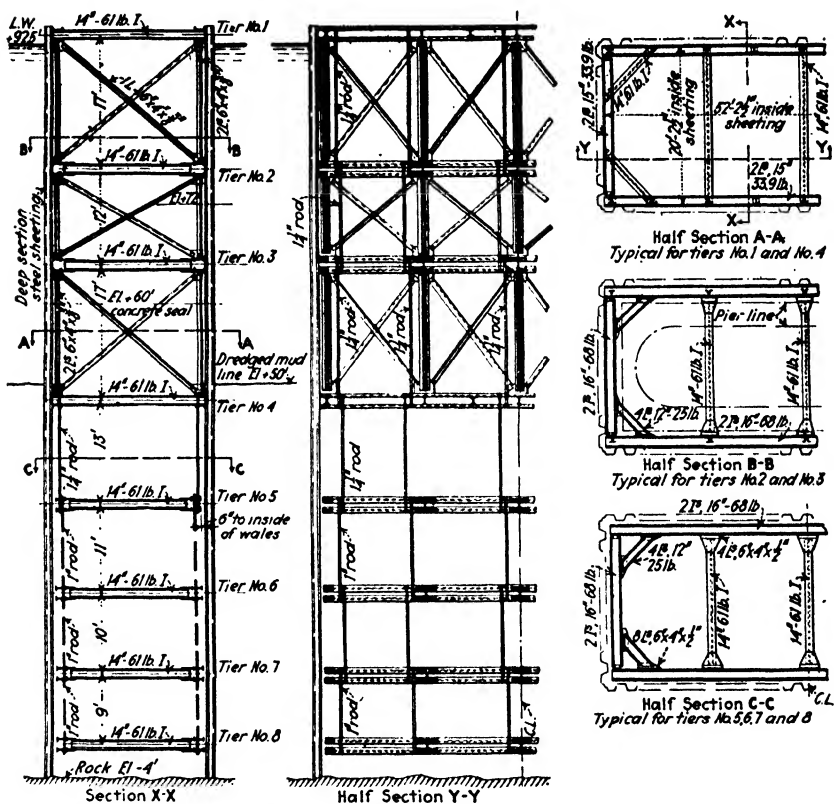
Cofferdam Used in Placing Pier of the Lake Champlain Bridge at Crown Point State Park, N. Y.
